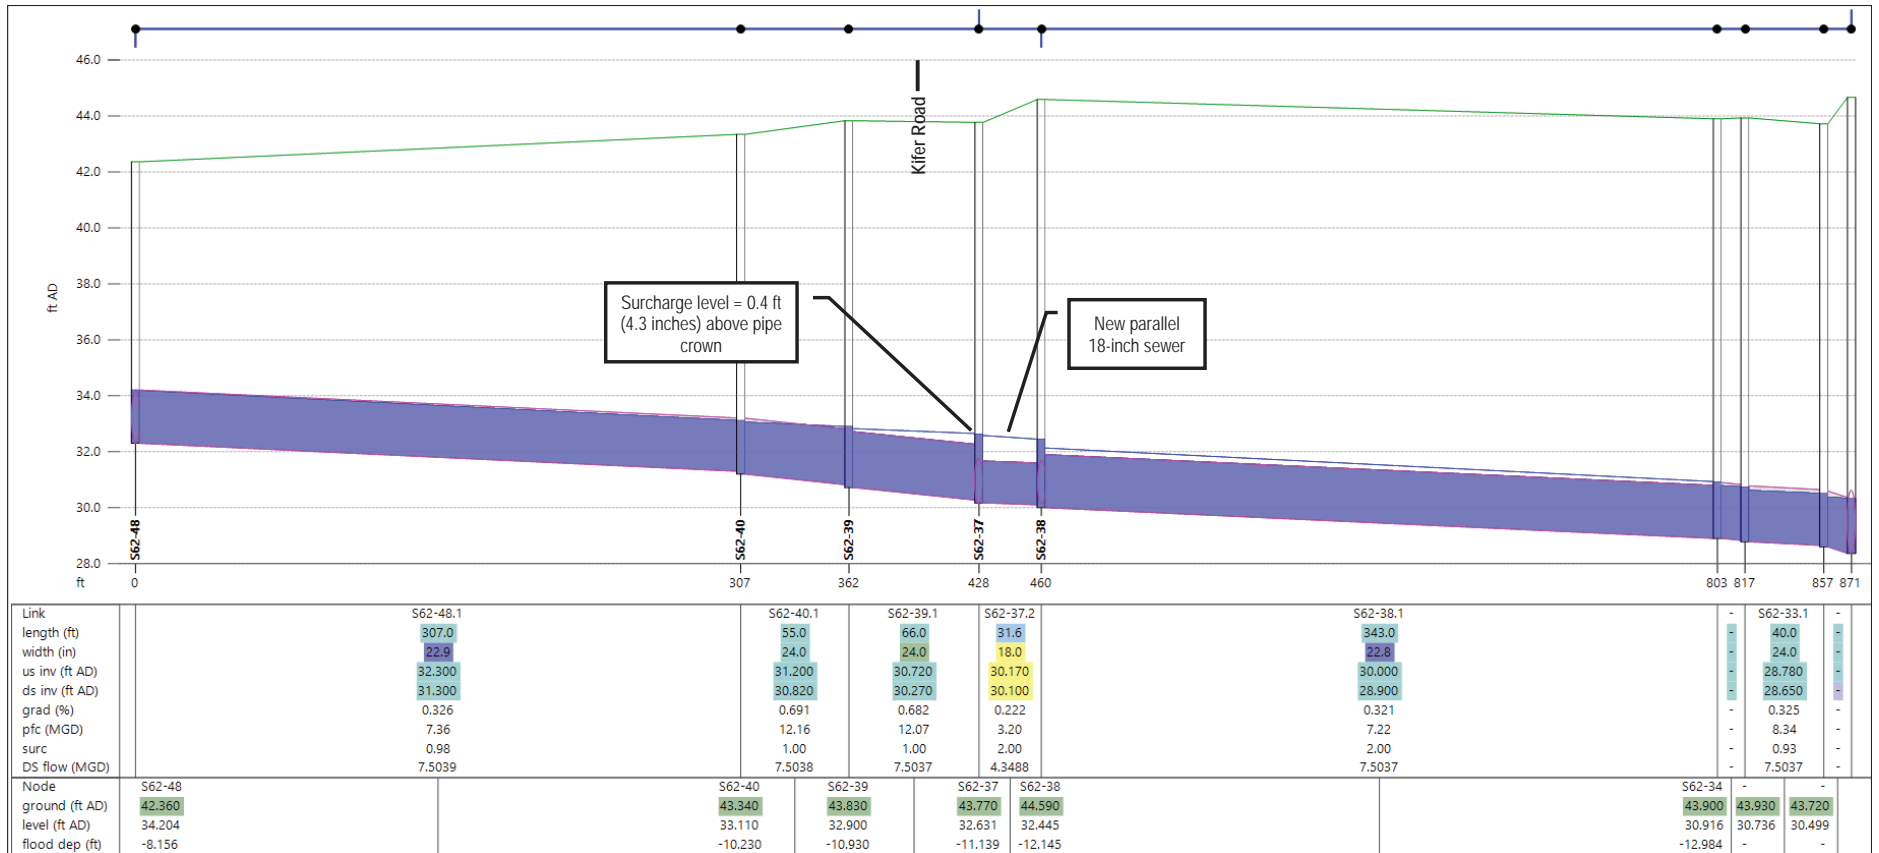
Final Alternative 4 Profile Great America Parkway West Trunk (Future 2035 PWWF)
